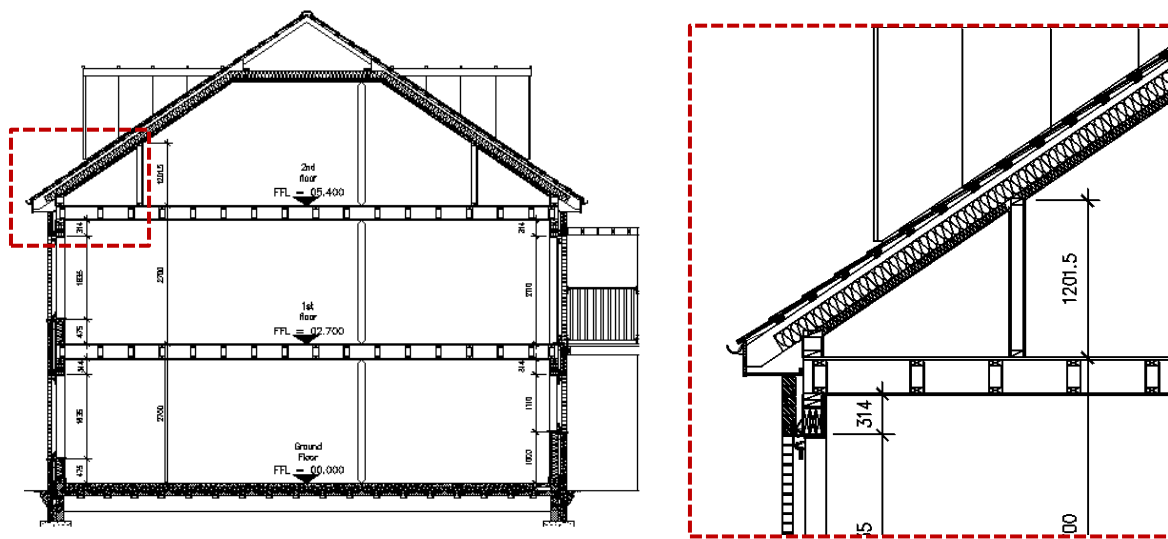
Section and wall detail showing unheated space behind bedroom wall.
